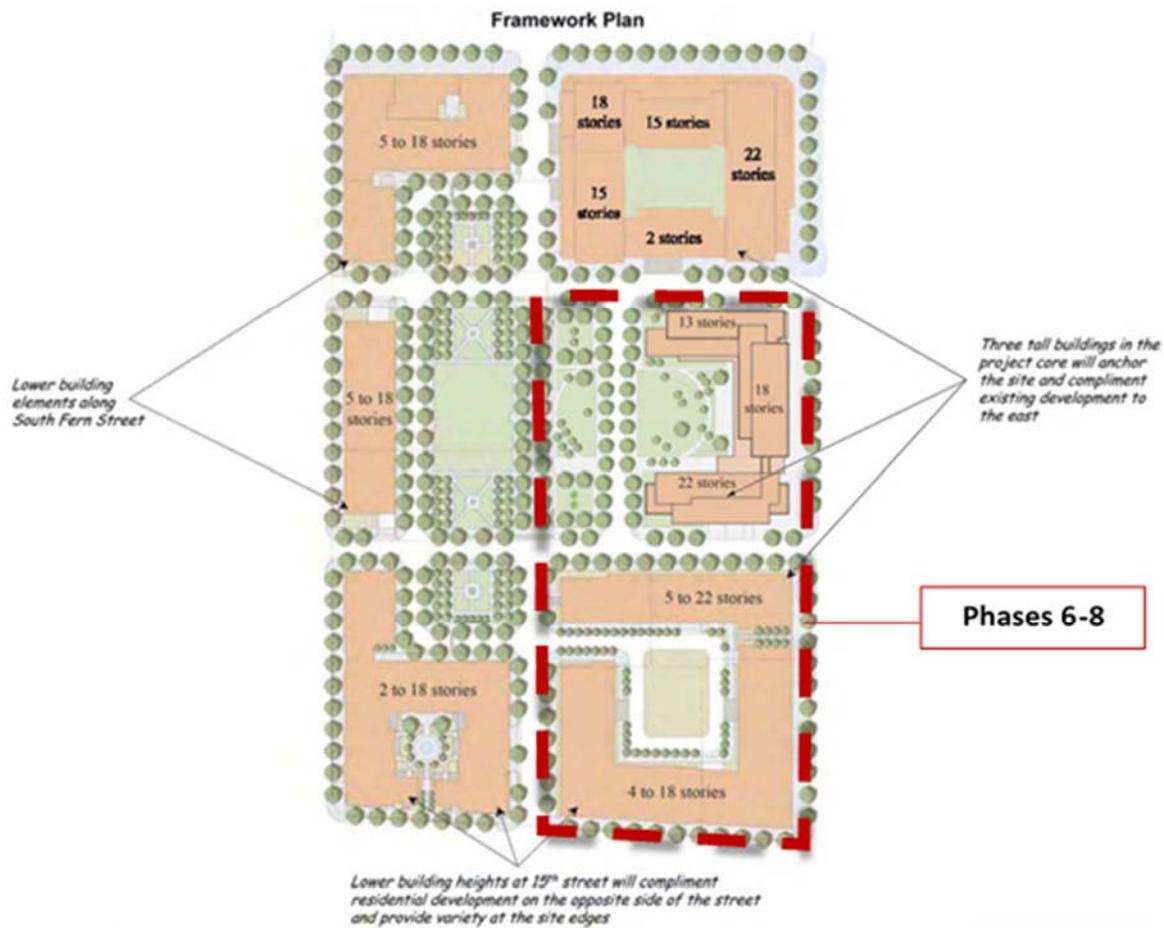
Metropolitan Park Design Guidelines, as amended 2016
